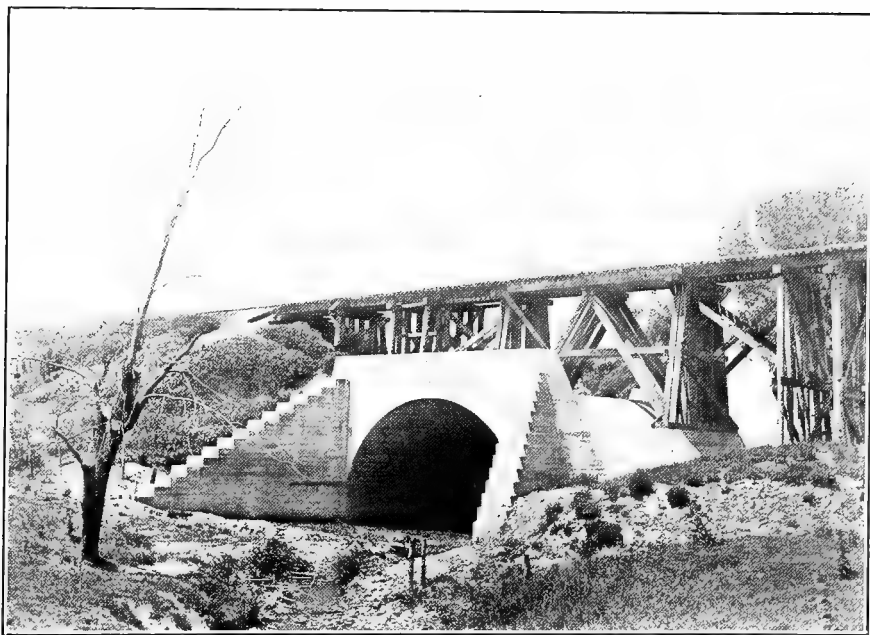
THIRTY FOOT CULVERT, C., M. & ST. P. RY.
